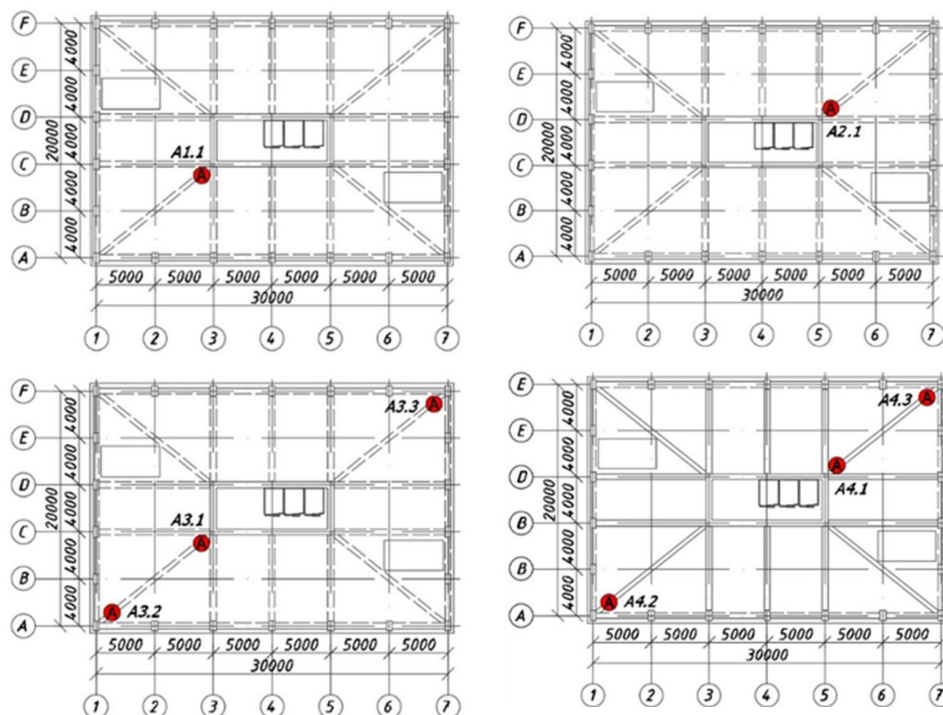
Location of inclinometers for a box-stem structural system with outrigger floors on 6, 12, 18, 23 floors
